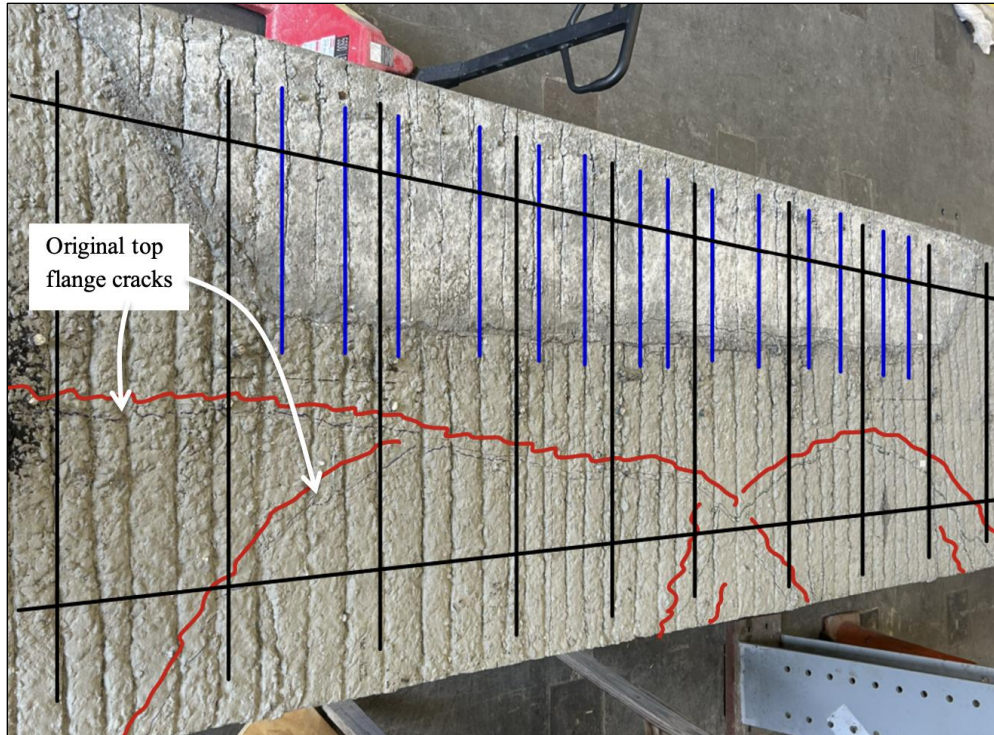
Photo. Test 1.3.F (repair 1.2LTF) overall top flange cracks.
